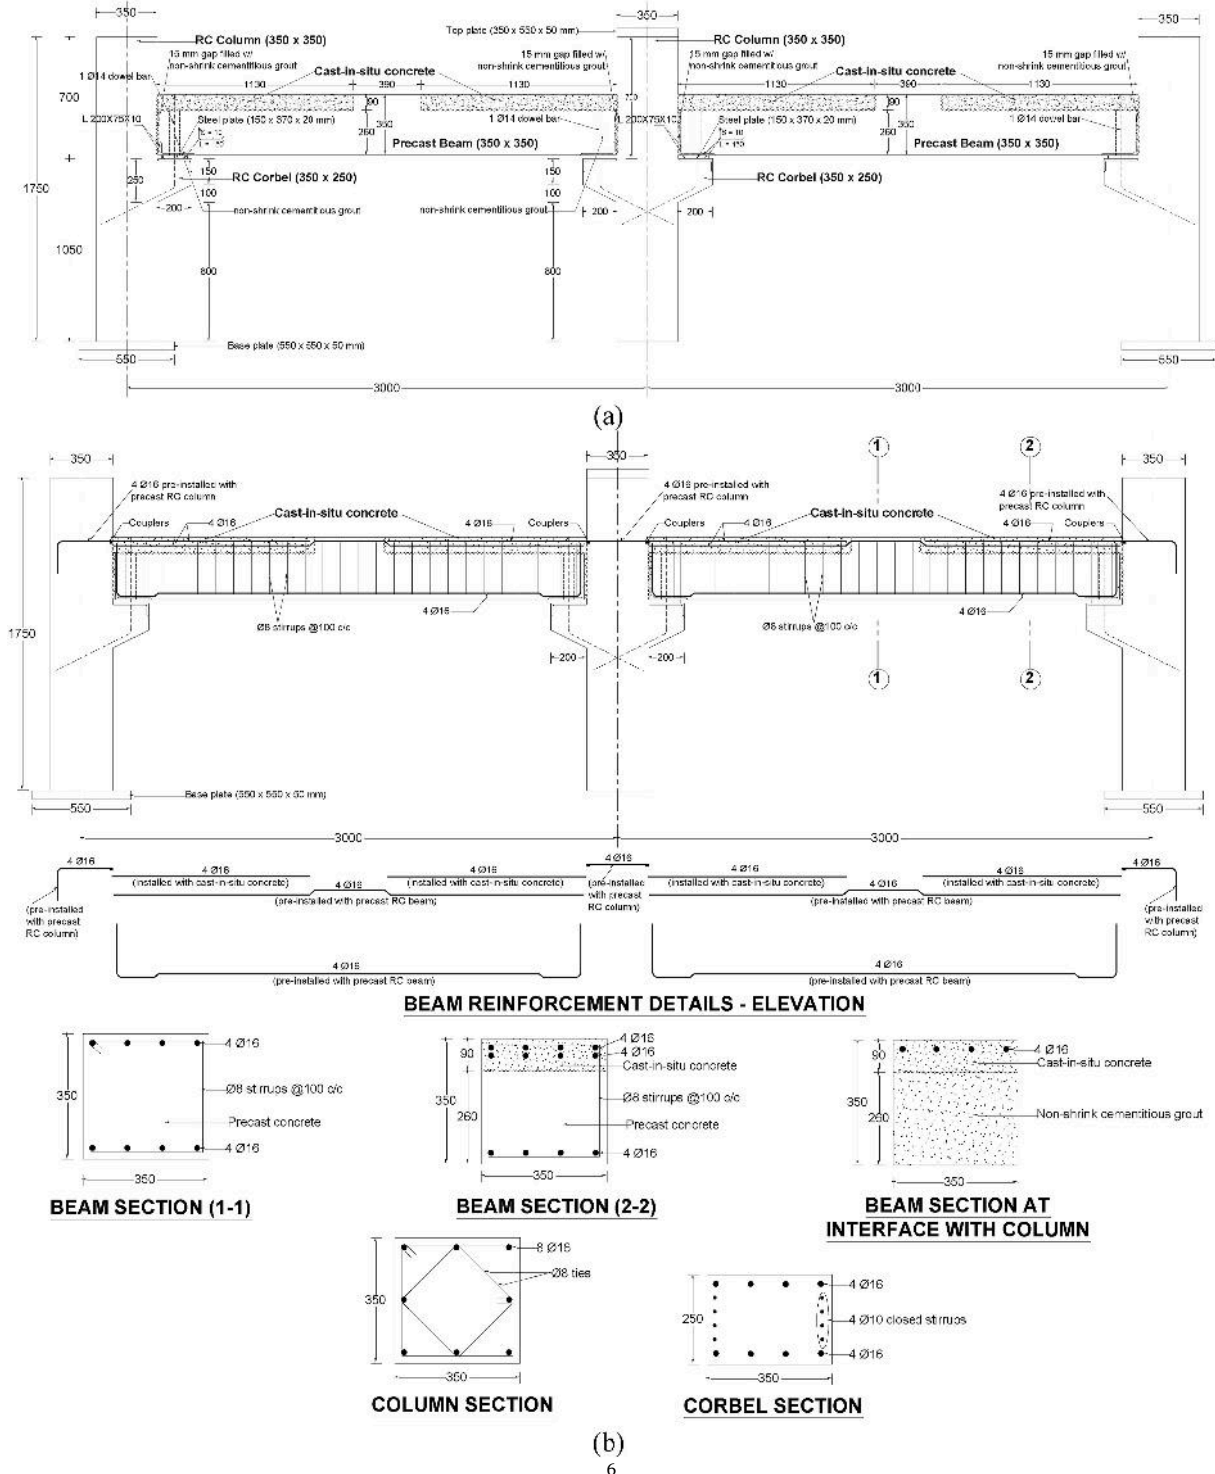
Details of precast assembly P-MC-T1-ANG with type 1 moment connection (Dimensions are measured in mm): (a) Concrete dimensions; (b) Reinforcement.
